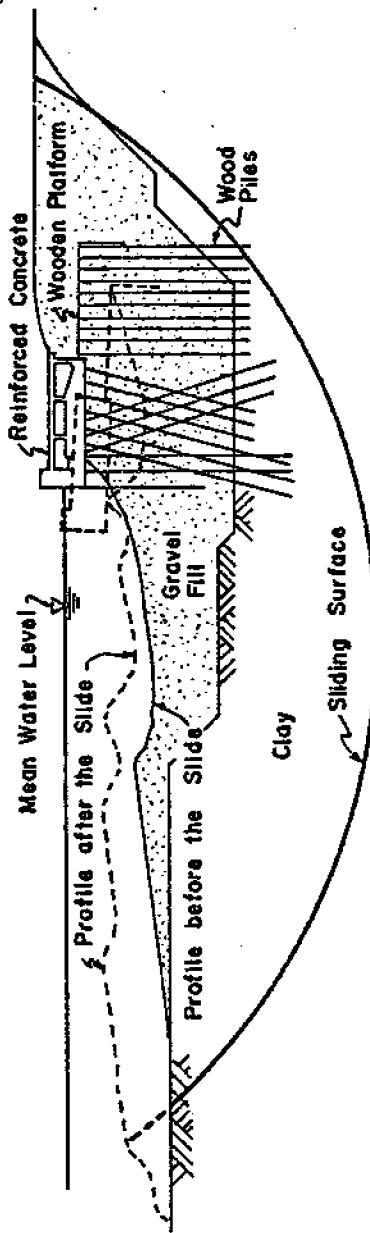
Deep-seated Failure of a Retaining Platform Because of Insufficient Bearing Capacity of Underlying Weak Soil
